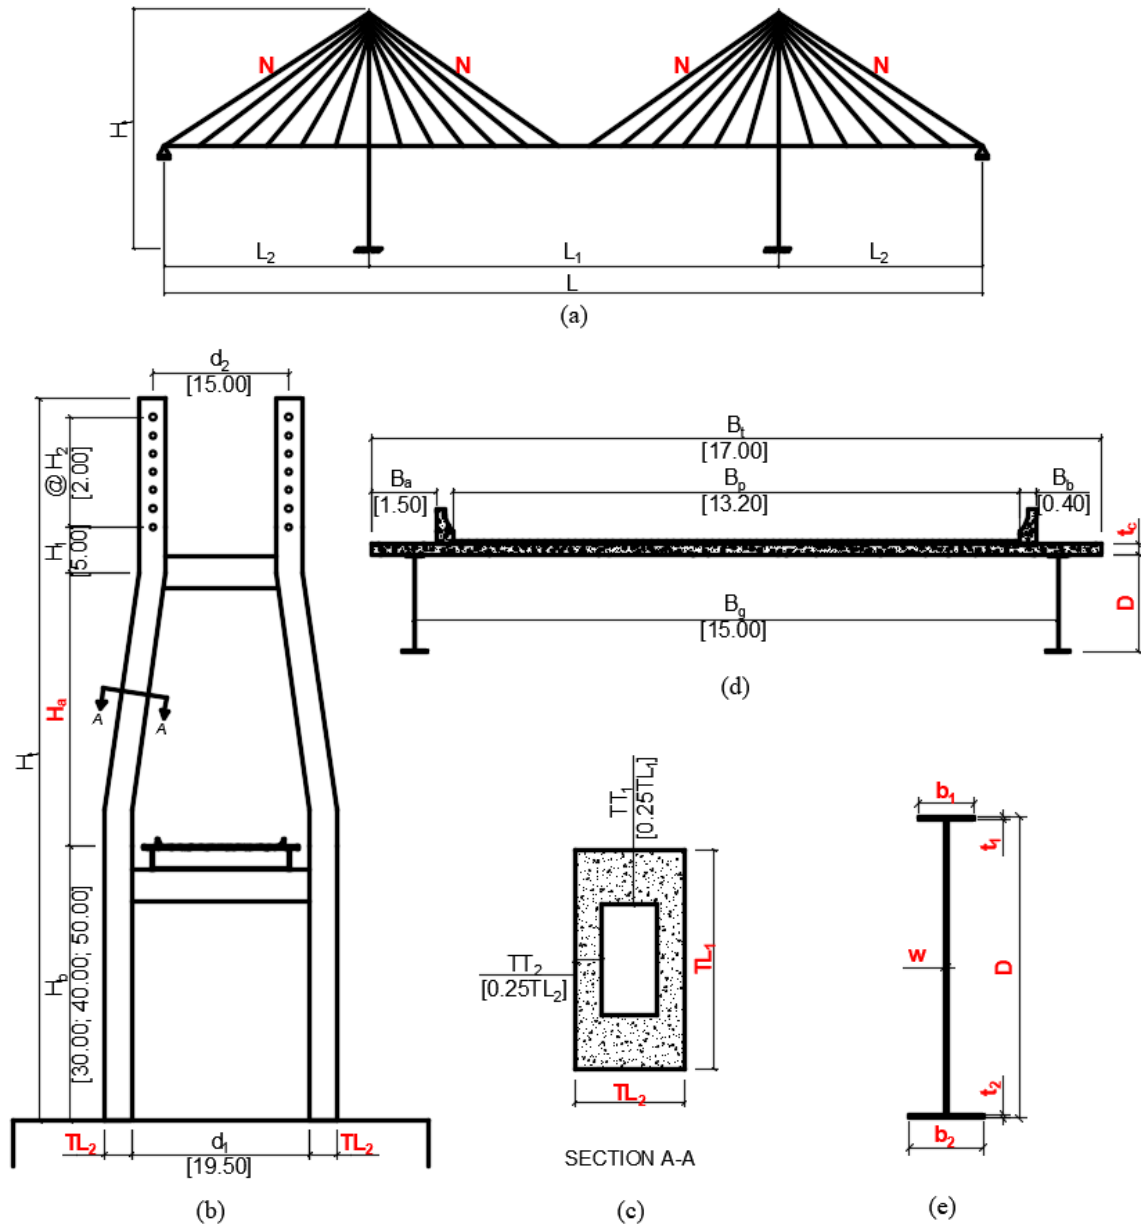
1: Cable-stayed bridge geometry: (a) longitudinal view; (b) tower dimensions; (c) tower cross-section; (d) deck cross-section; (e) steel I-girder dimensions. Dimensions in meter.
